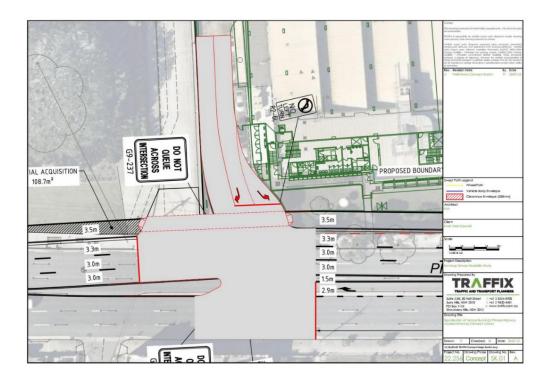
Concept Plan for Bunnings Tempe Signalised Princes Highway Access Driveway
